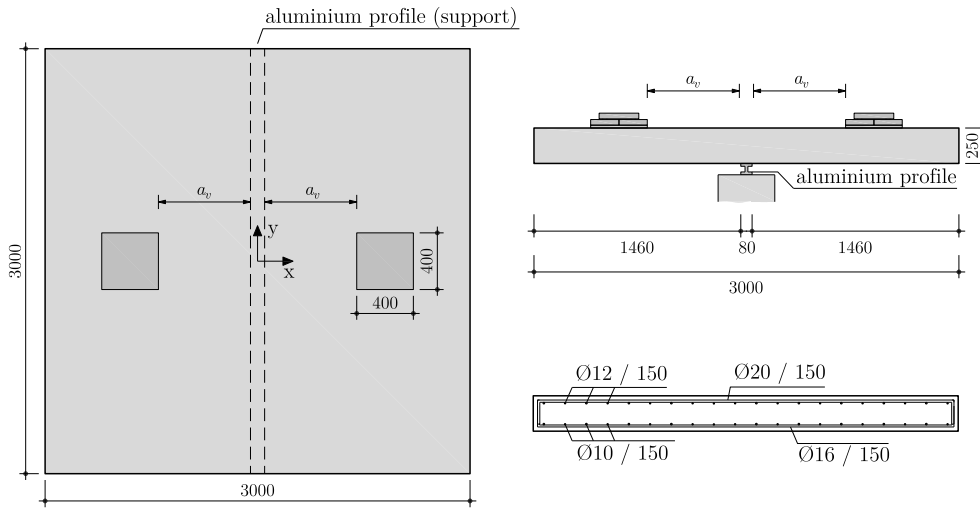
Geometry and reinforcement layout of tested slabs (dimensions in [mm])
